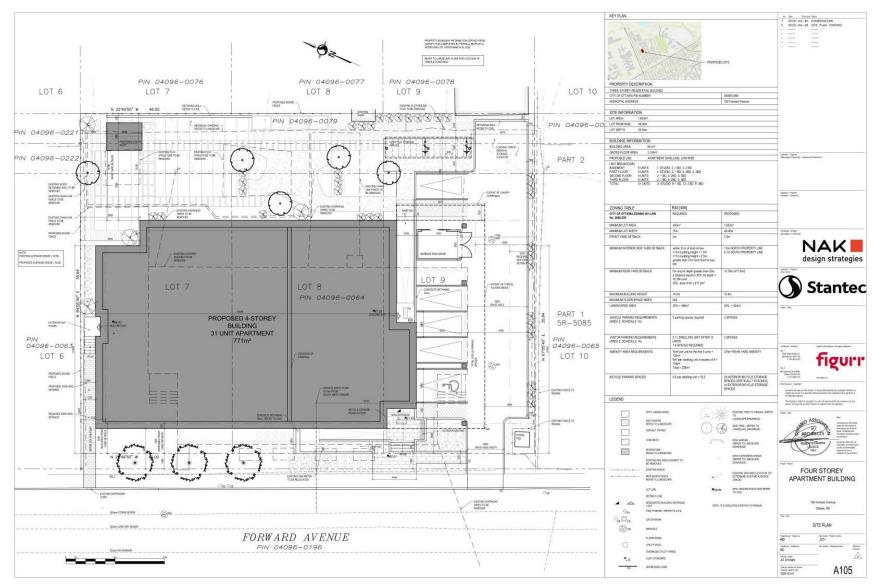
159 Forward Avenue – Site Plan (Figurr, dated April 28, 2020)
